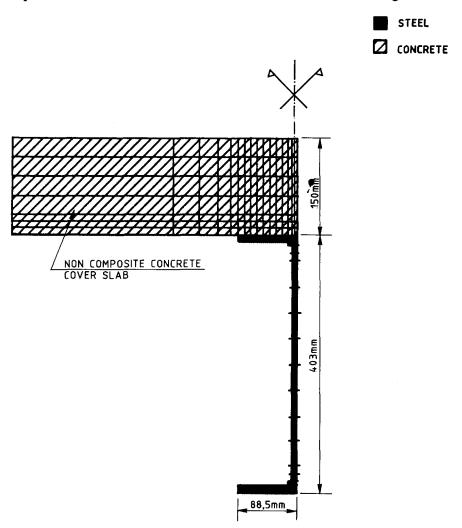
Discretization of the beam cross-section and concrete cover slab by 141 rectangles.
